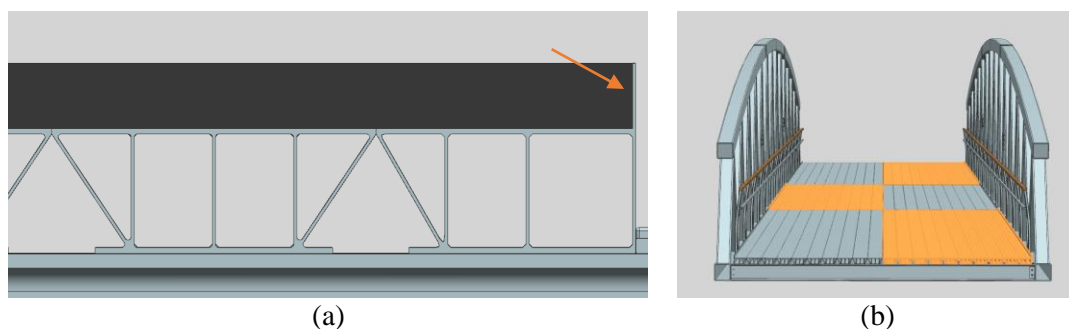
Bridge deck profile: a) FSW bridge deck with end profile. b) FSW panel lay out.
